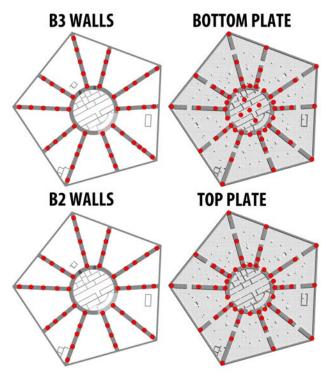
Strain gauges alignment in box foundation structures (gauge sections shown with red dots)
